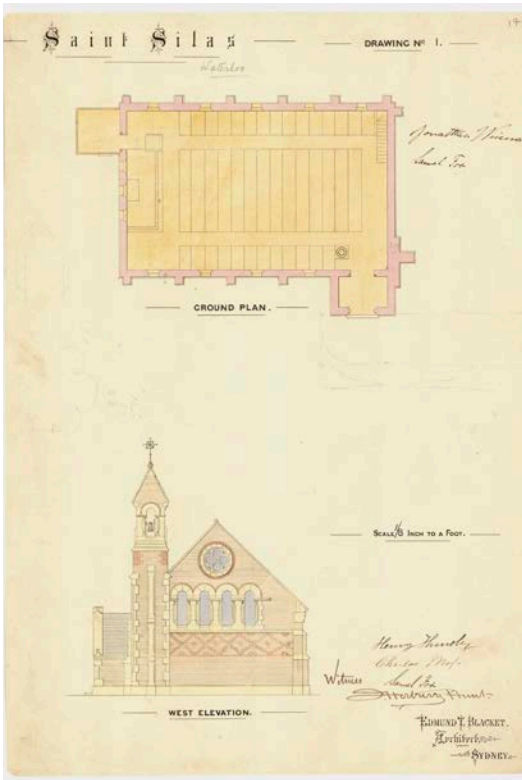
Plan and West Elevation of St Silas Church, drawings by Edmund T Blacket.
